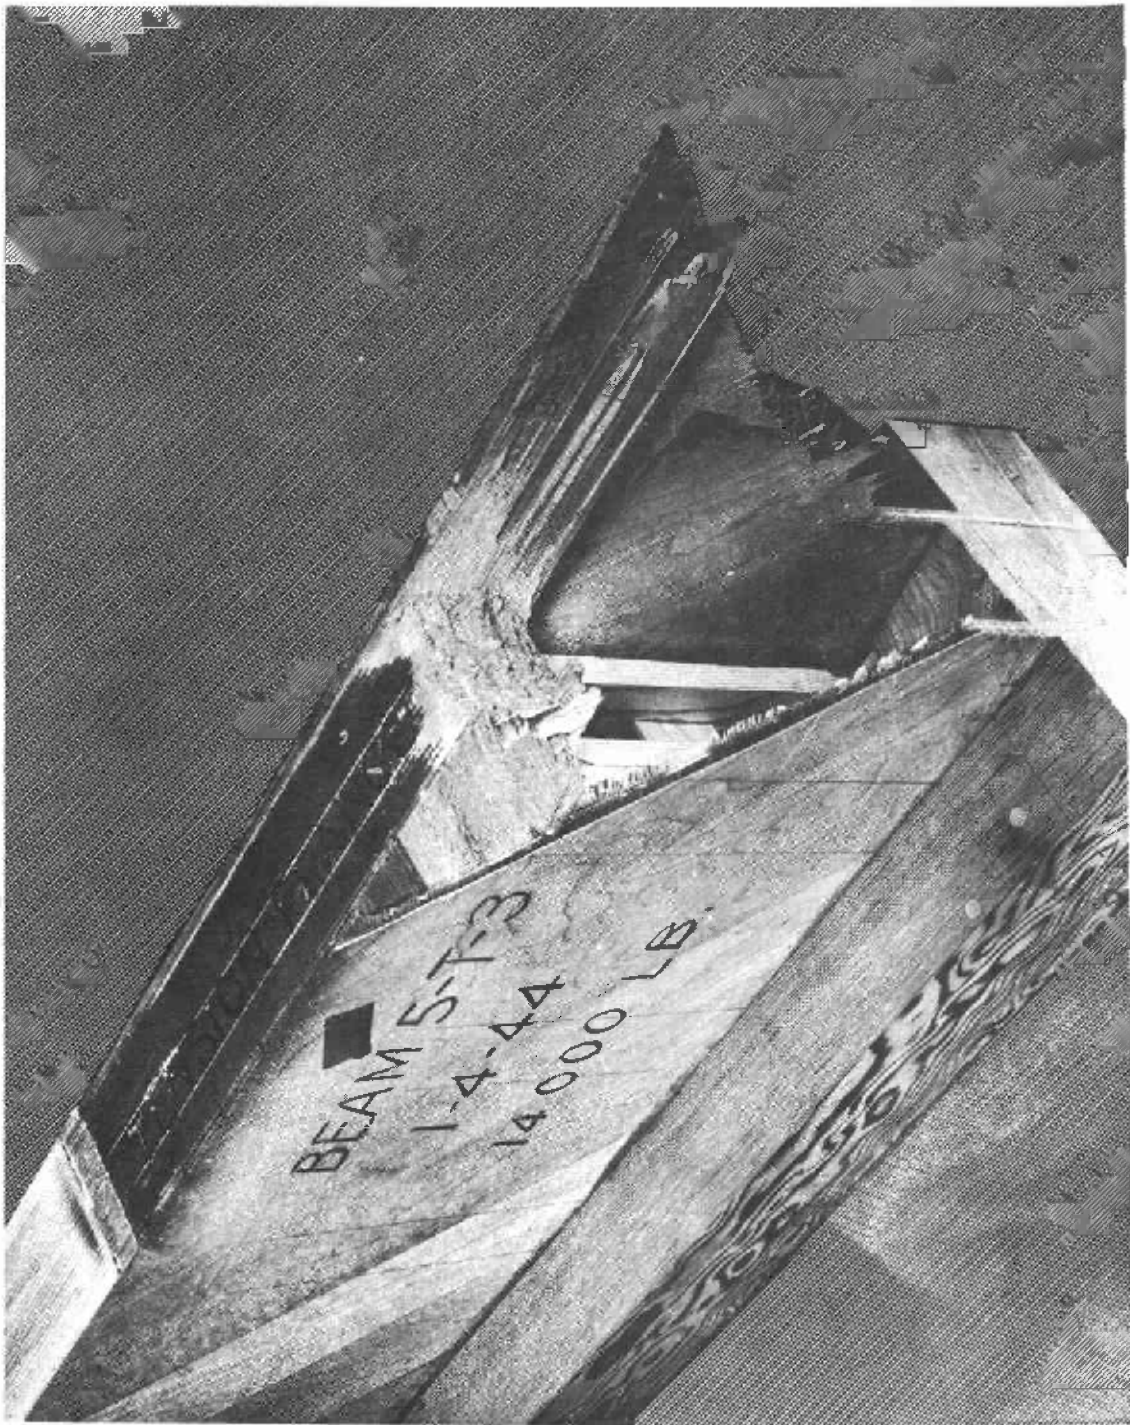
Beam 5-T-3 after failure, showing brash character of tension flange failure when preexisting compression failures are present. (Part of compression flange removed).
